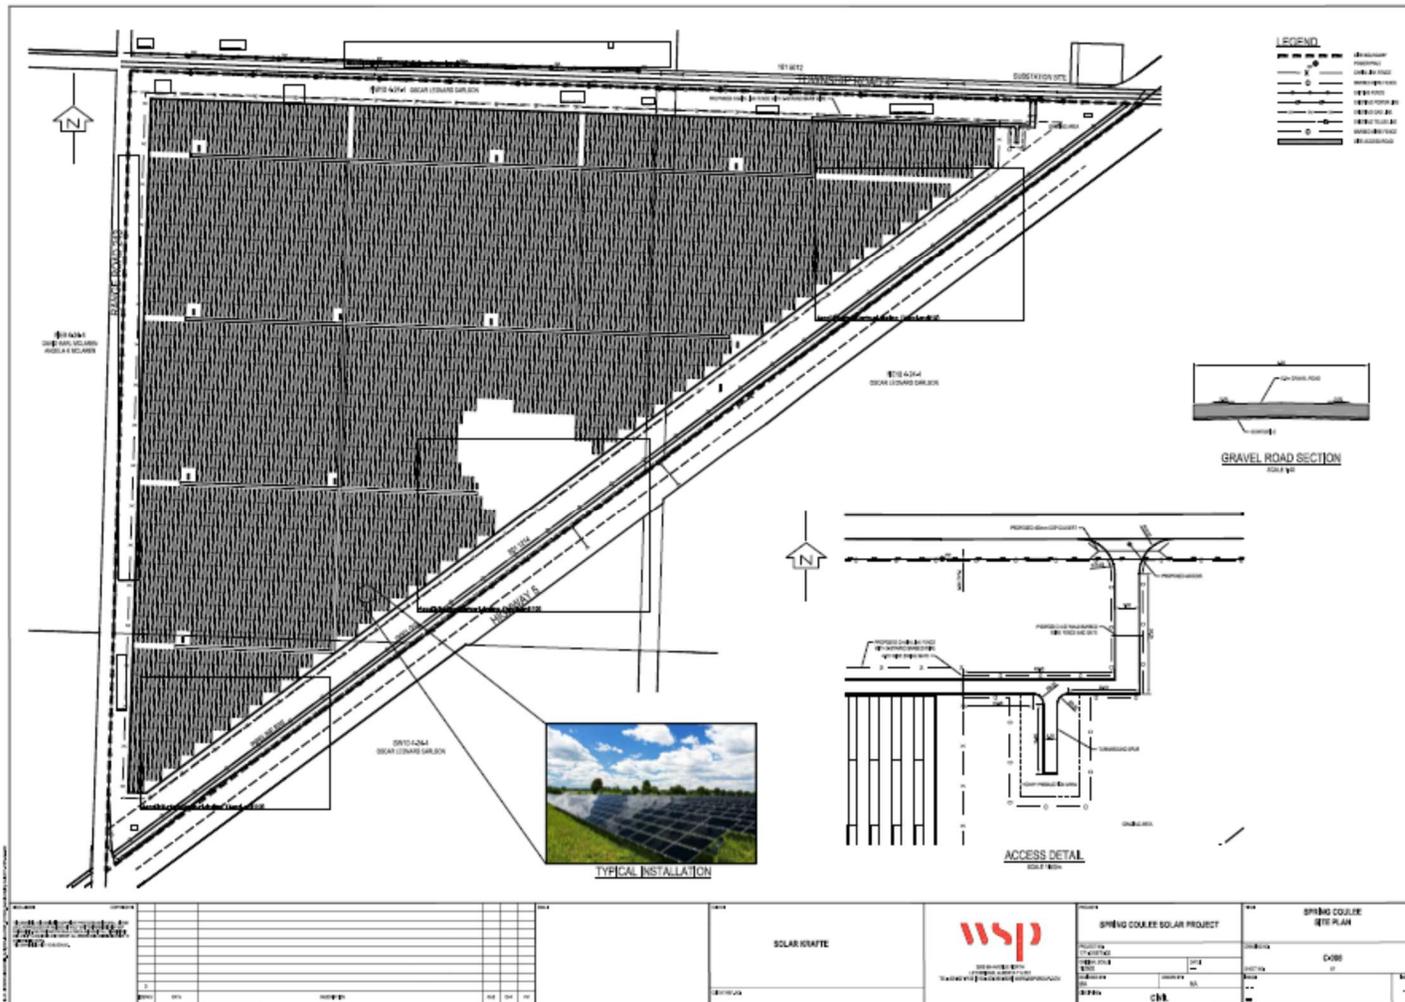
SPRING COULEE SOLAR PROJECT SITE PLAN
